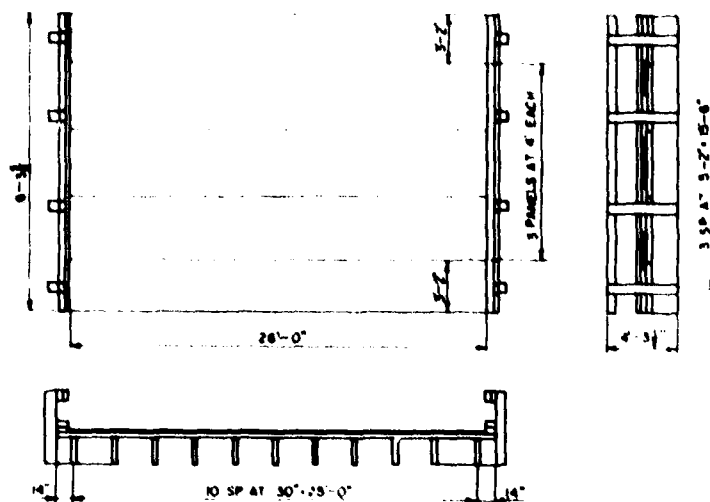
Construction schematic of Press-Lam bridge over Stony Creek, Va (M 145 646)
